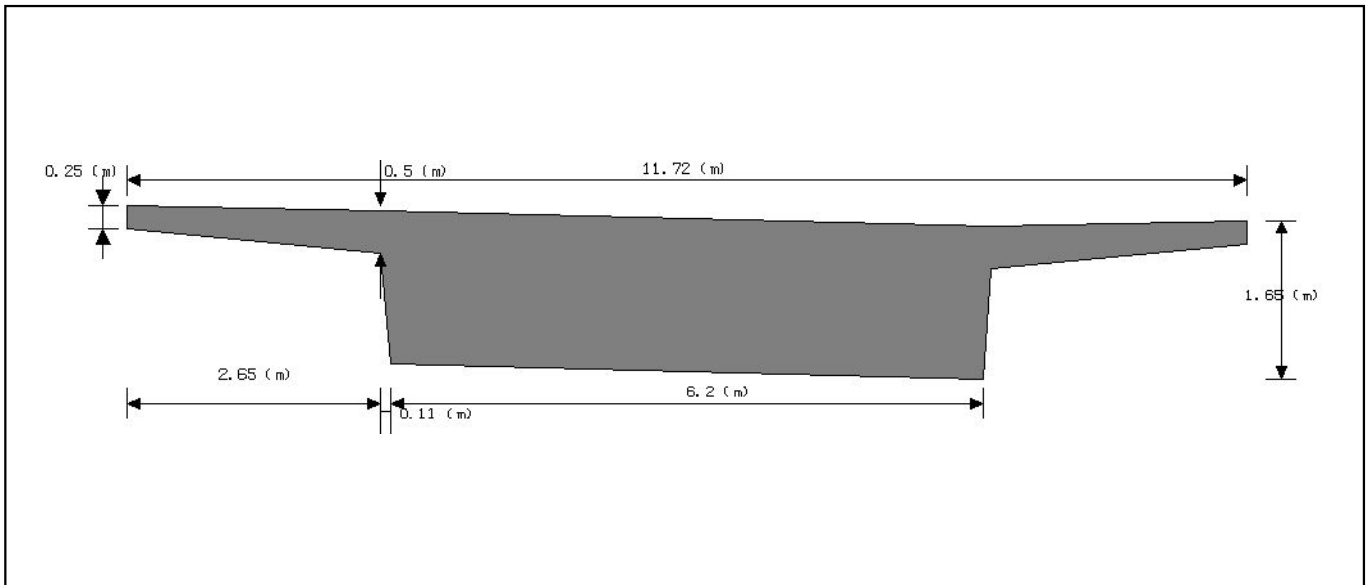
Down station view for Span06 cross section - Station 0.0 .
